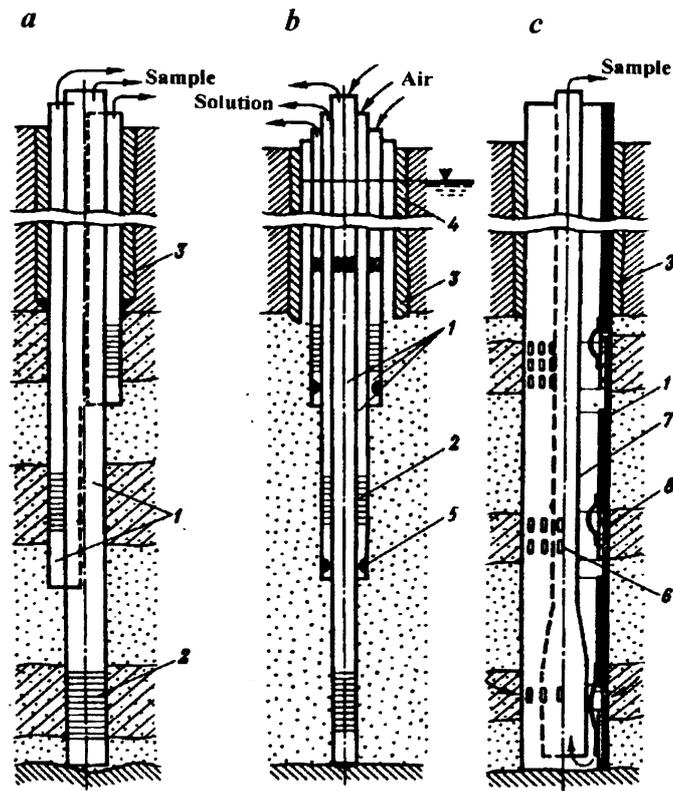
Observation well: *a* — with parallel casing strings; *b* — with concentric casing strings; *c* — one-column unit: 1 — casing strings; 2 — screen; 3 — surface casing seal; 4 — well column; 5 — packer; 6 — opening in screen; 7 — sampling column; 8 — spring valve.
